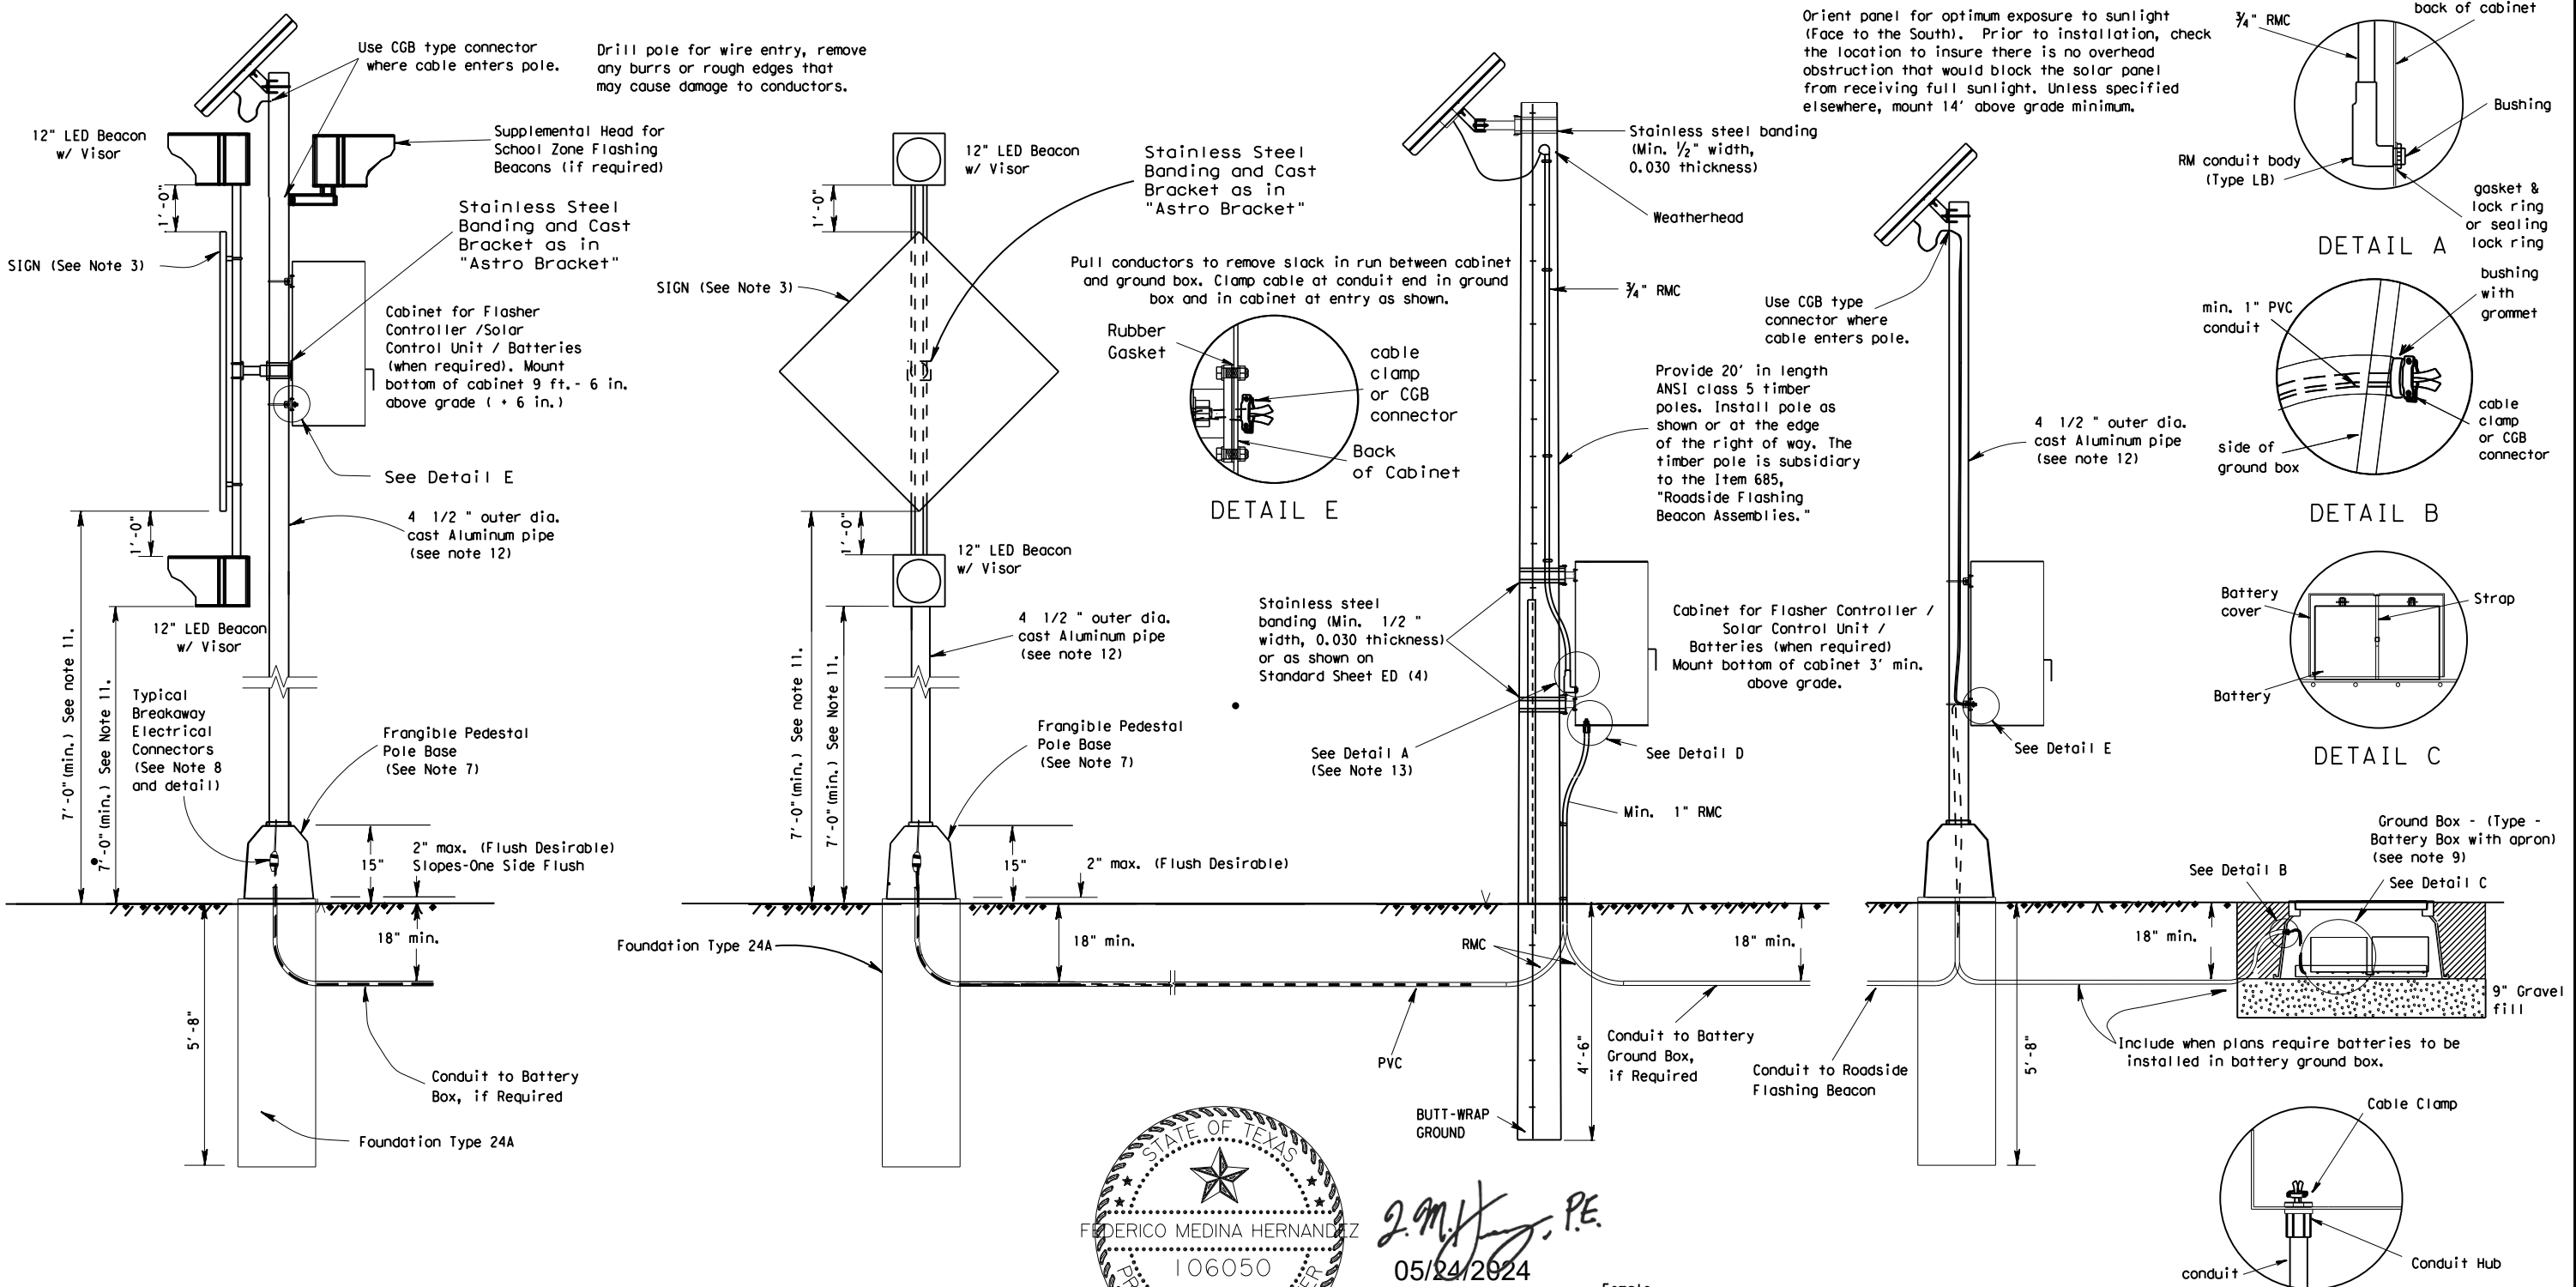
DETAILS OF SOLAR POWERED FLASHERS (FTW)
